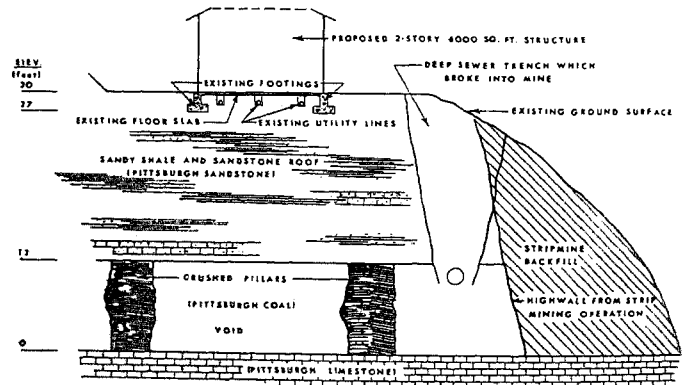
PROFILE THRU SHALLOW MINE BELOW STRUCTURE
